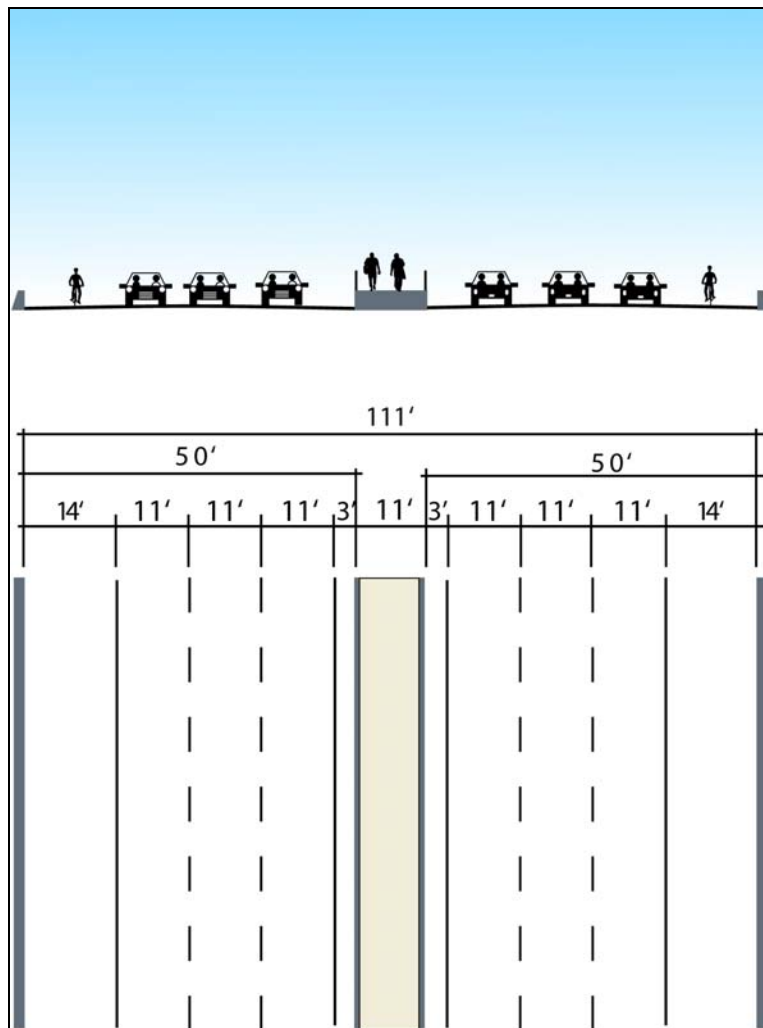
BR 14/11/11/11/11/11/11/14 Manchester Bridge
